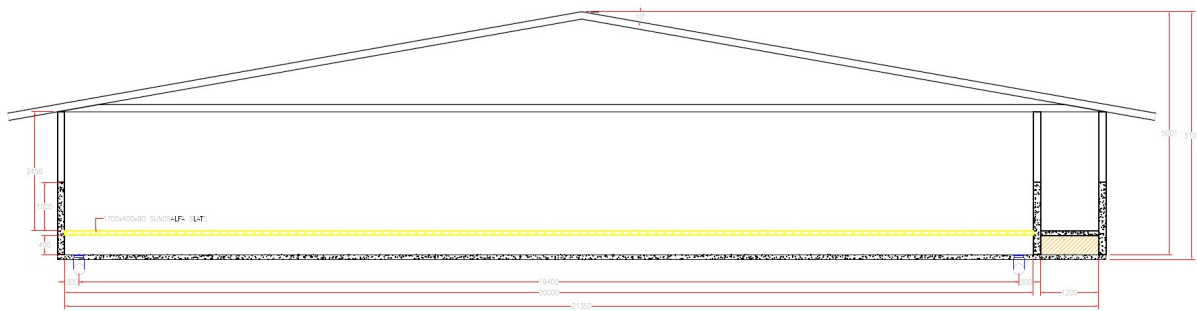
Farrowing Shed – Elevation View of Front including Drainage Details
